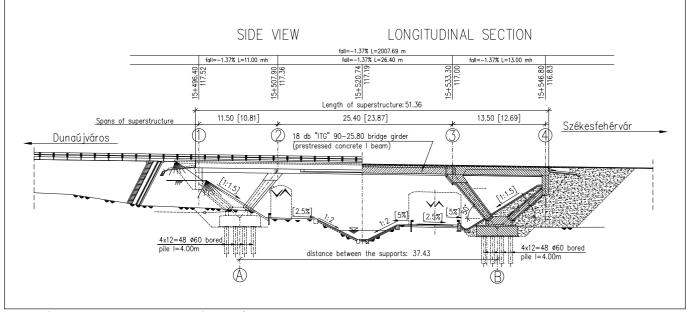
Side view and longitudinal section of the Perkáta bridge
